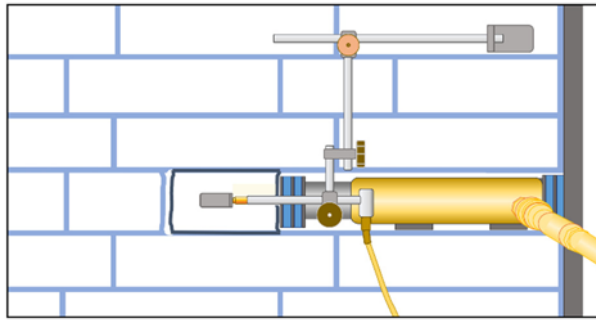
Scheme of test setup at the wall's 6th layer with LVDT tip resting at the middle of the test brick front surface and hydraulic jack resting with back against the steel plate
